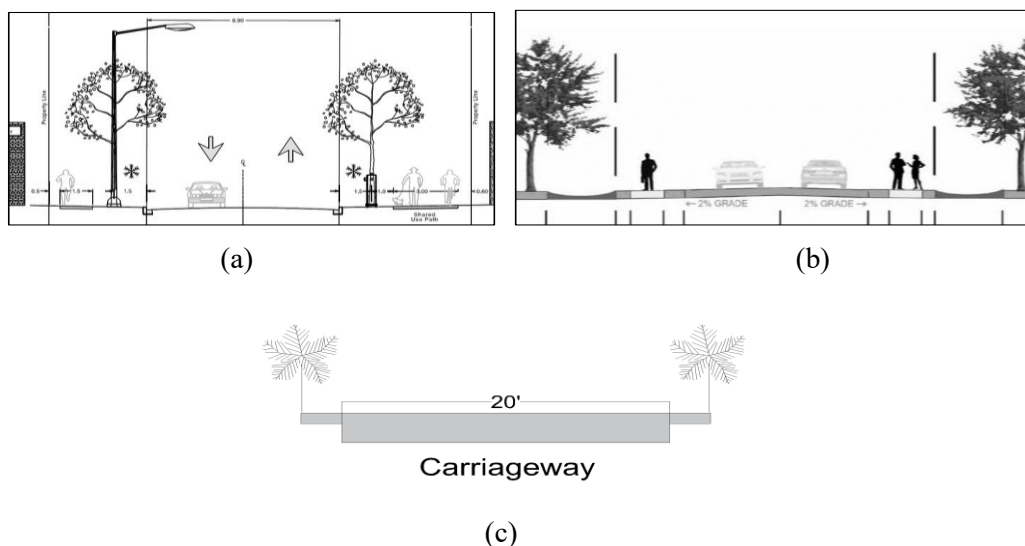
Cross Section of (a) Primary Road, (b) Secondary Road and (c) Access Road.
